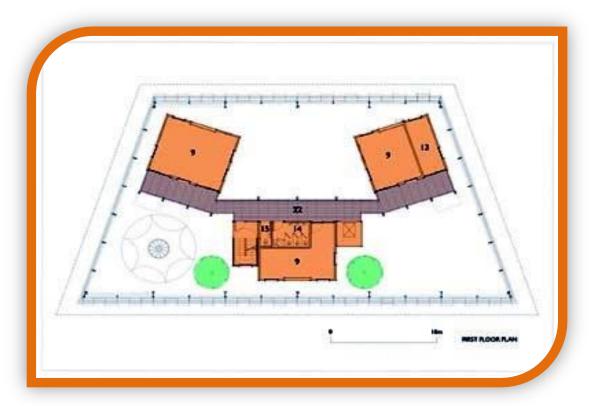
First Floor Plan of Fawood Children Centre | Source: Roderick Coyne/Alsop & Partners(2016)
